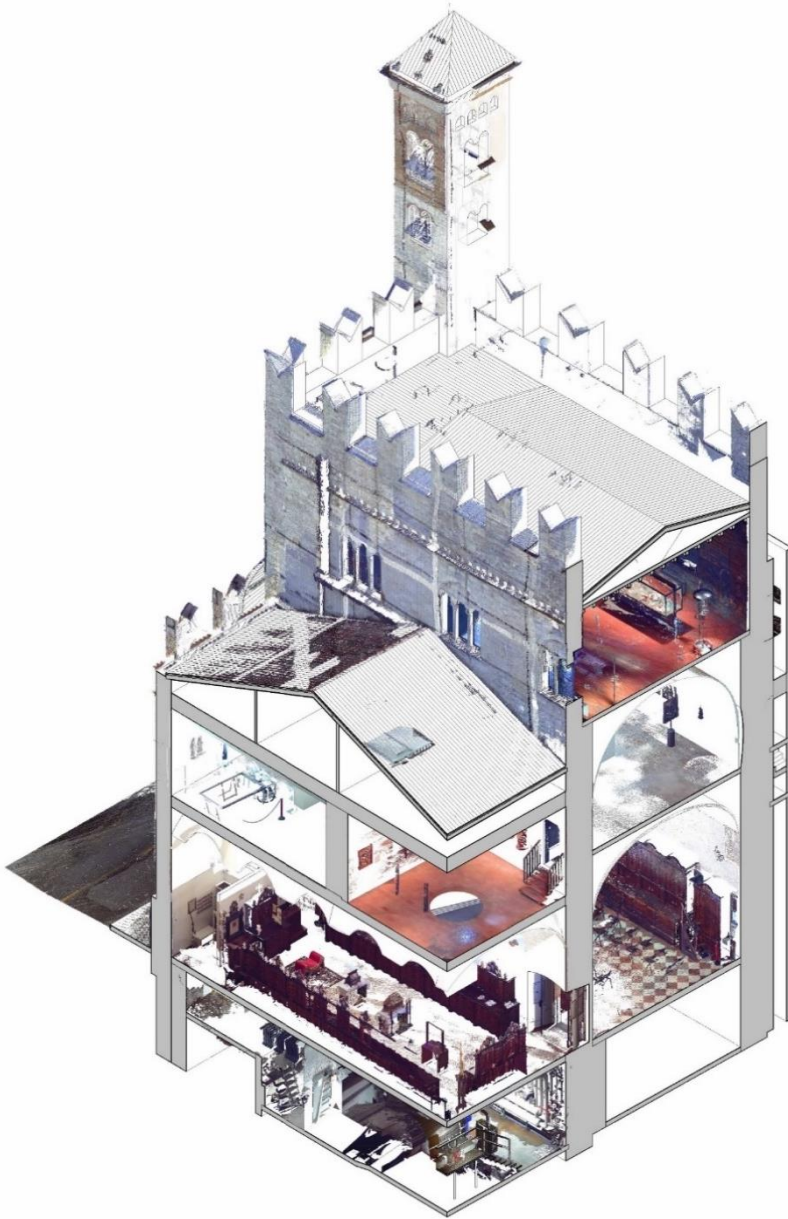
Heritage Building Information Model of the Castelletto of Palazzo Pretorio.
